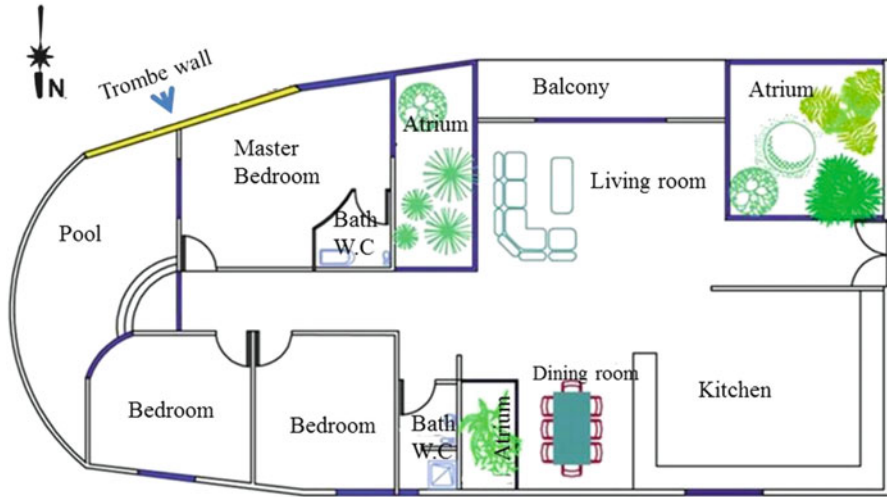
Recommended plan for Mesan Apartment (drawn by author)
